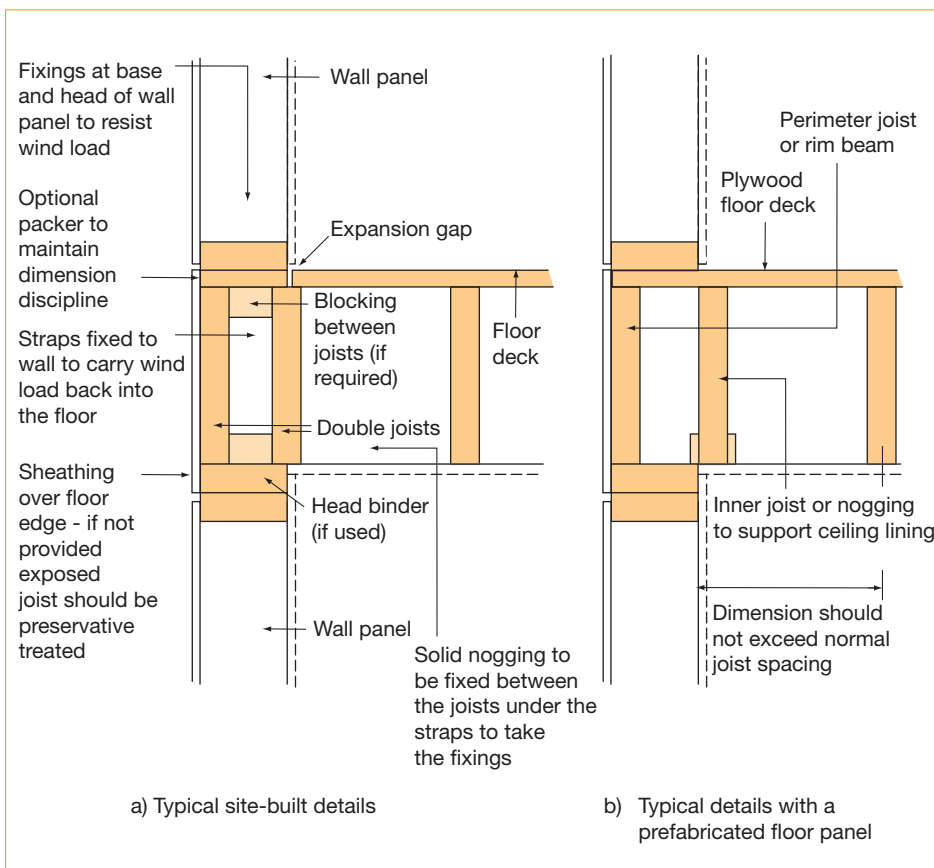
Typical intermediate floor/external timber frame wall junction details: joists parallel to wall
